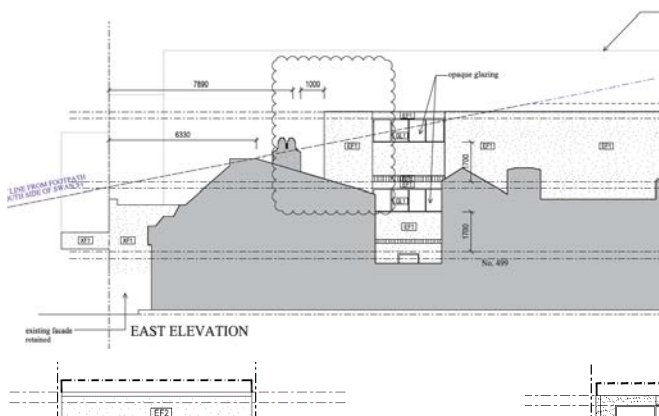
A permit (991710) has been approved at 497 Swan Street for the construction of a three-storey building. This east elevation demonstrates that the additional built form was proposed to be setback approximately 9m from the street frontage in order to retain the profile of the heritage building on the site.
